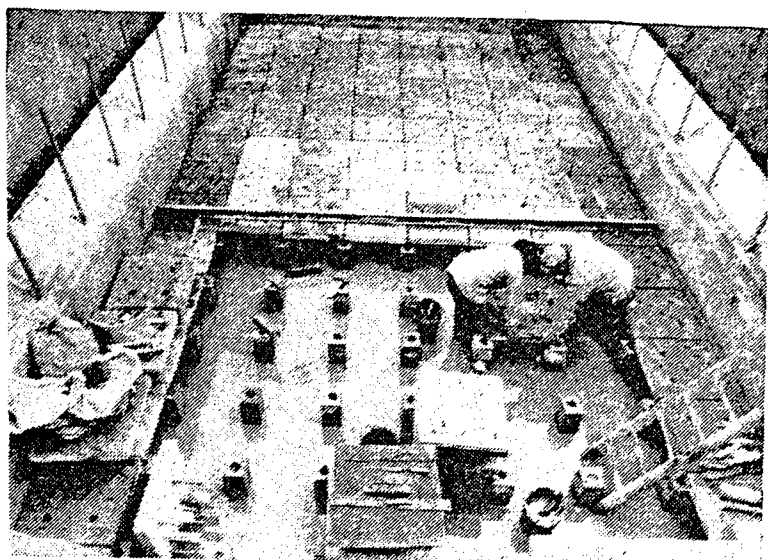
Construction of false bottom and strainer underdrainage system.
